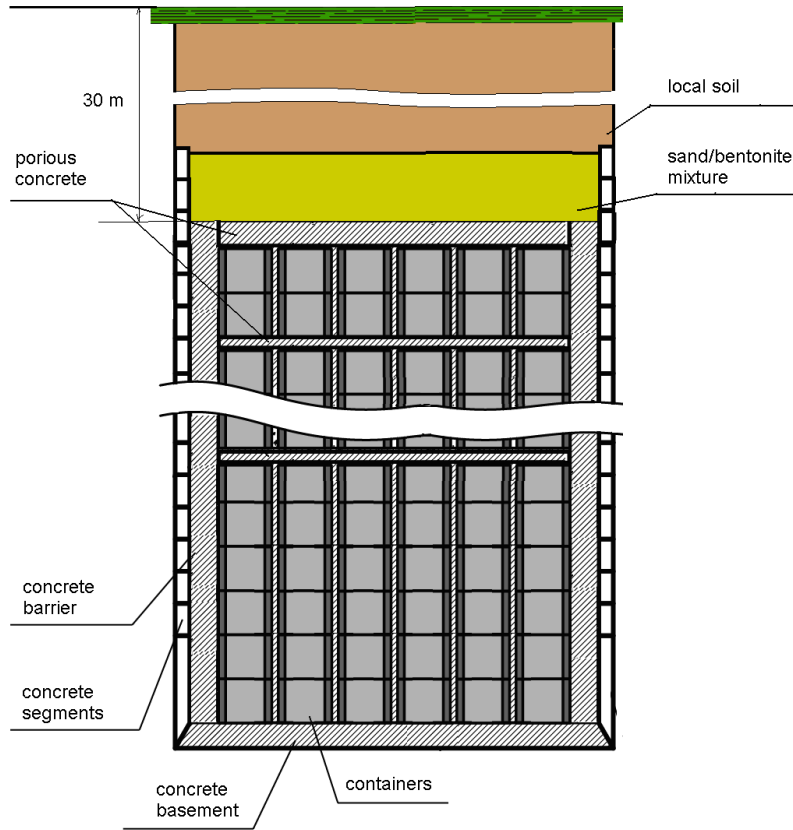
Conceptual design of NSDF: cross section of closed concrete vaults and the main engineered barriers multilayer capping system [9]
